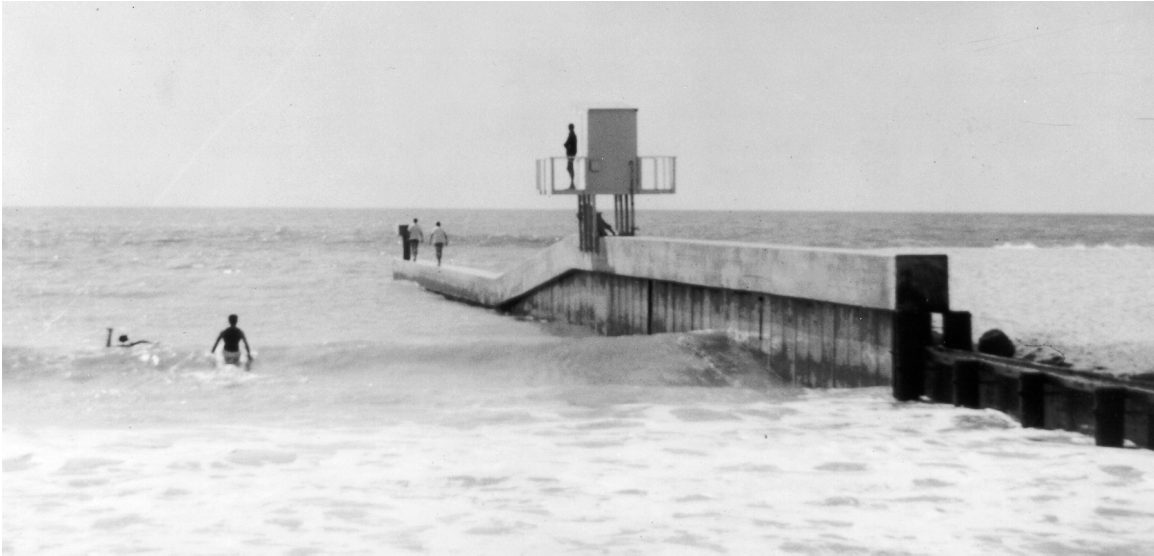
Timber-steel sheet-pile groin, New Jersey
